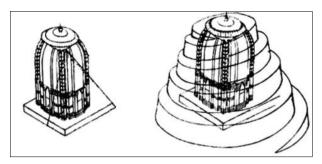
Sketch of Solid mud ramps/sand filling design used to carry stone slabs for temple construction
